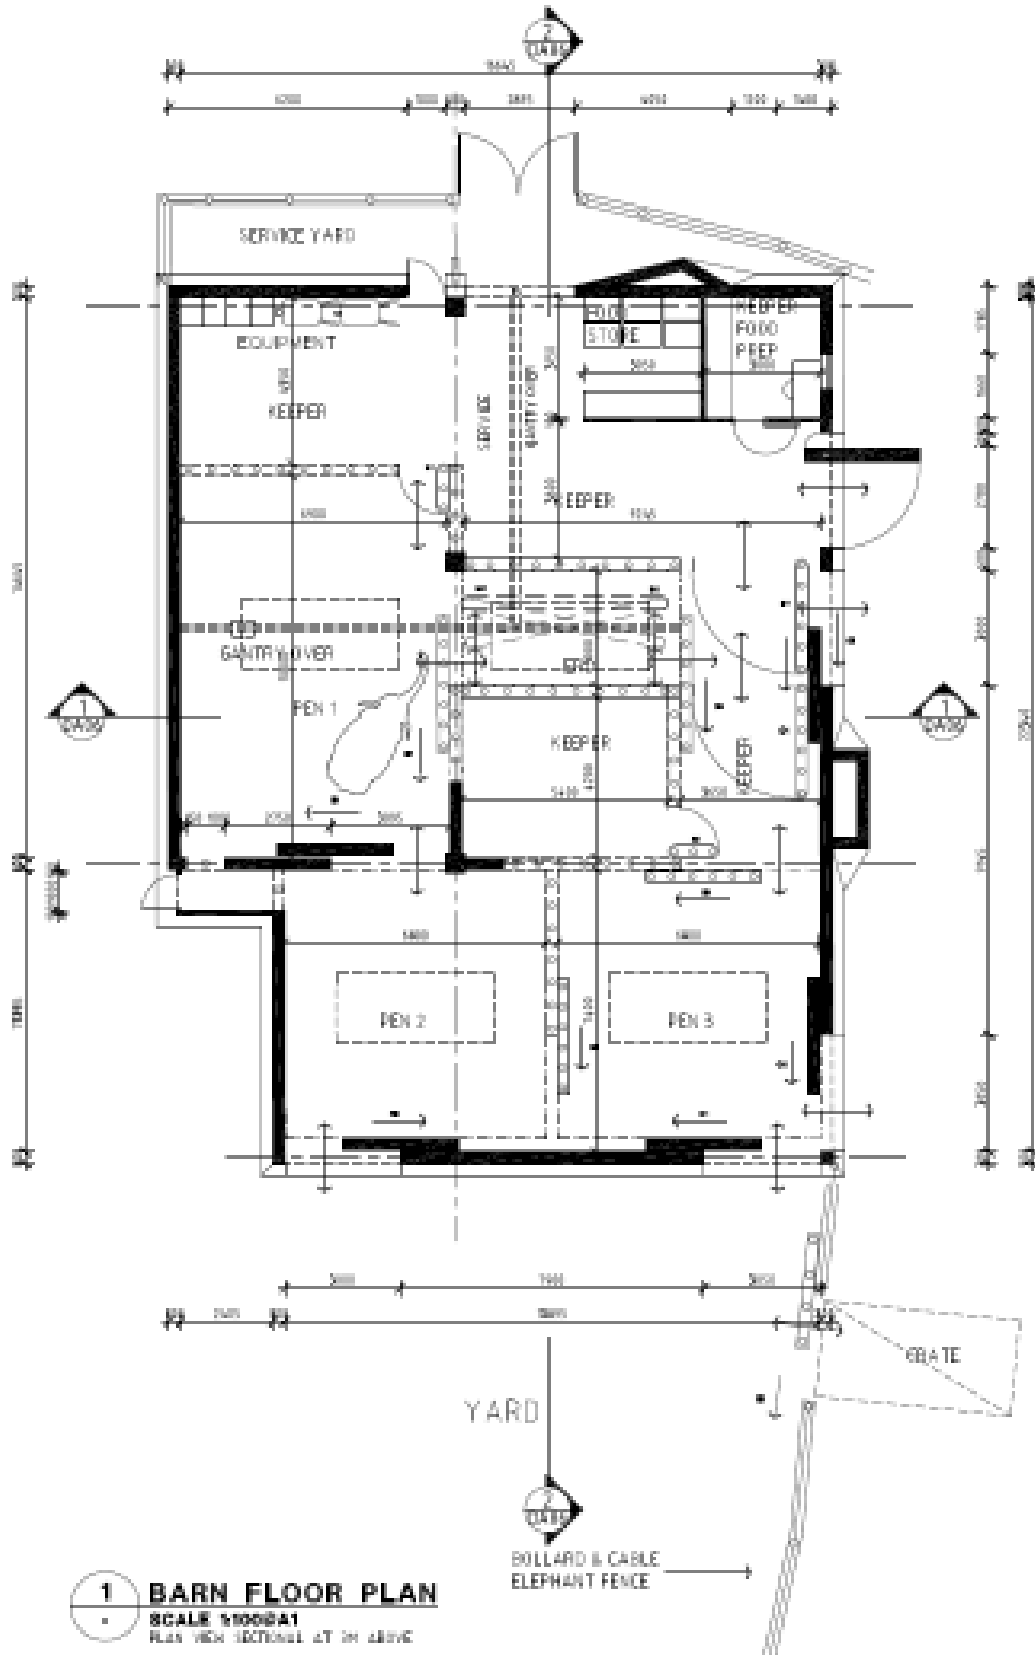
Proposed Barn (i.e. Bull Elephant Holding Facility) – Floor Plan
